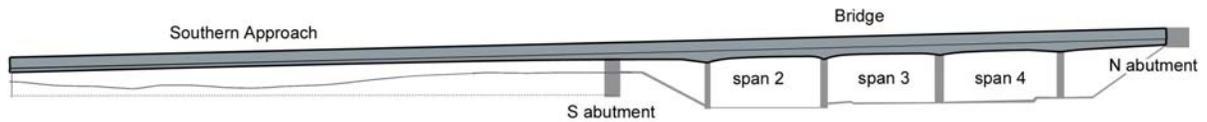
Bridge 9103 consists of a 211'-long, five-span, continuous concrete slab bridge with an integral 220'-long southern approach structure. U.S. Highway 63 travels on top of the bridge and approach (see Figure 2). Passing beneath Span 2 is the driveway to the Red Wing Shoe Company shipping and parking area. Passing beneath Spans 3 and 4 are the east- and westbound lanes, respectively, of U.S. Highway 61 (sketch by Gemini Research).
